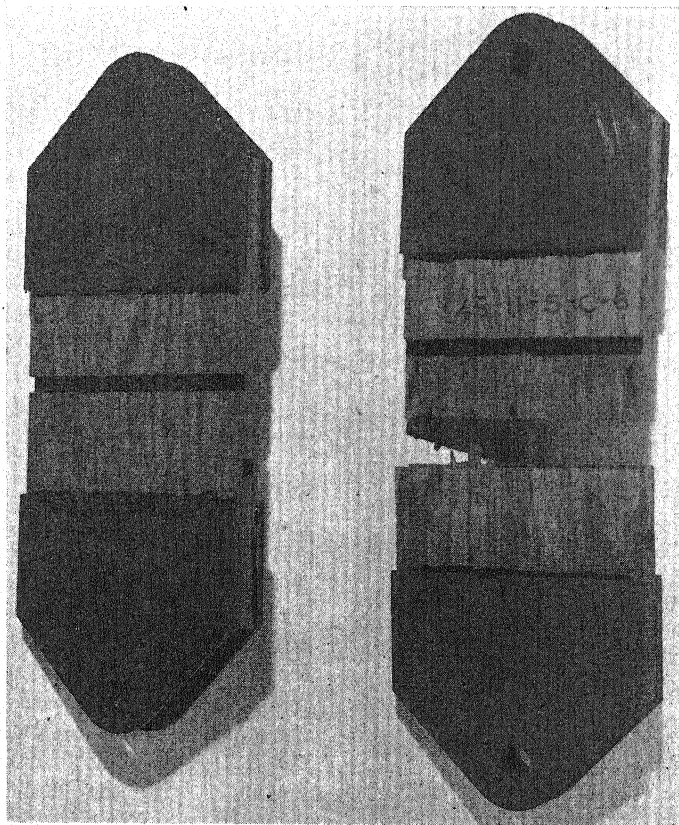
Douglas-Fir Laminated Glue-Shear Specimen and Typical Failure.
